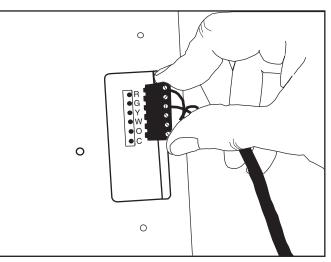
TERMINAL CONNECTOR REMOVAL AND REPLACEMENT
